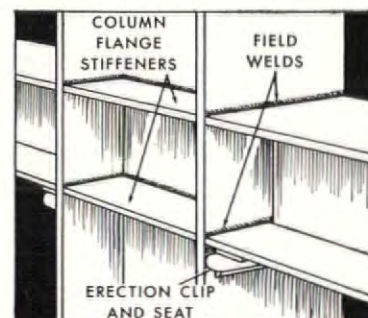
Typical Beam-to-Column connection, simplified by welding, eliminates costly angles to speed erection.
